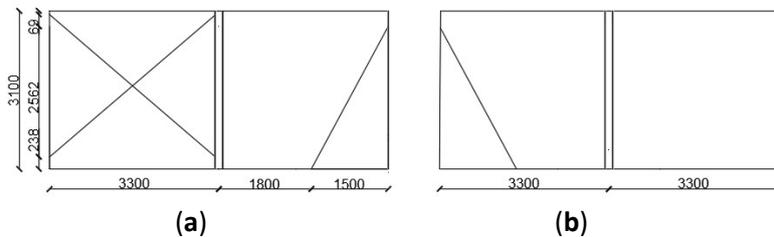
Variant 3.1 Mix: (a) Front facade, (b) Back facade.
